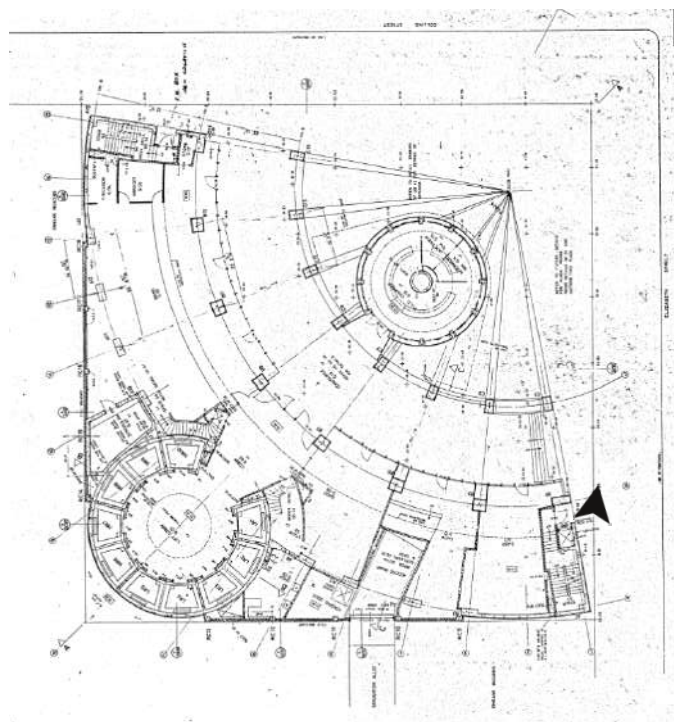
Ground floor plan, drawing dated 1969 (BAP).
